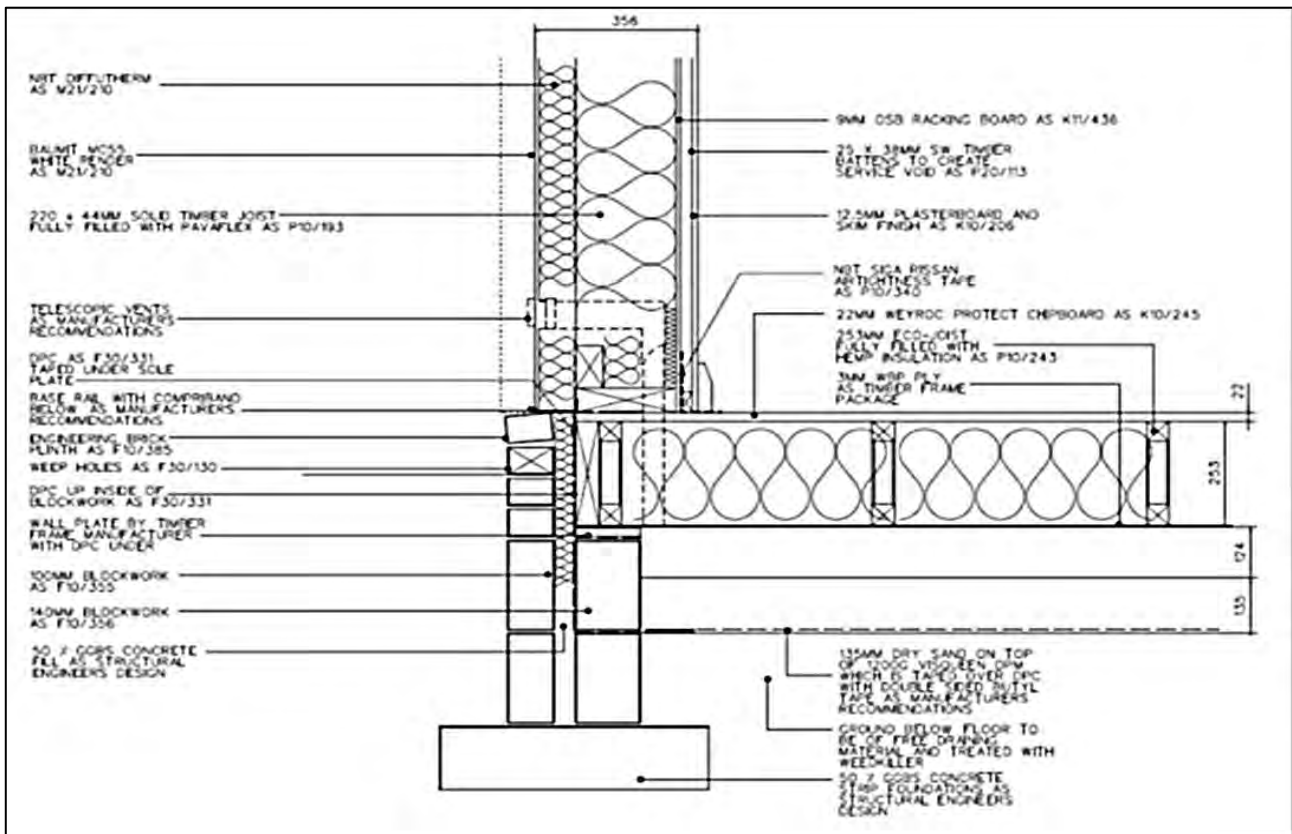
Construction Drawing, Party Wall to Ground Floor Junction Detail (19 May 2011)
